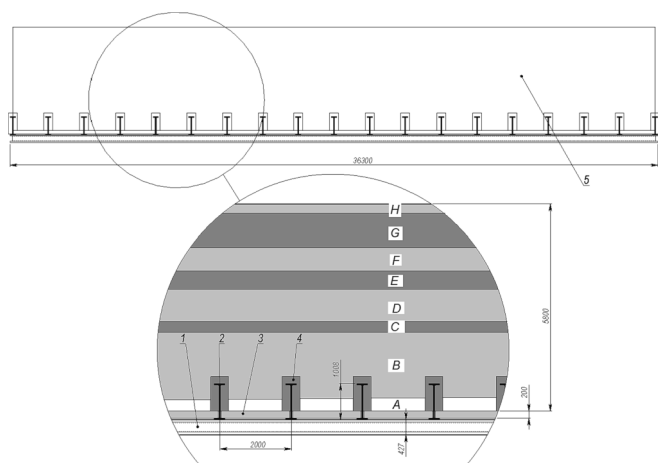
Diagram of cross-section of the engineering barrier of 5.8 m: 1 – H-beam profile HD310x310x500, 2 – H-beam profile HE1000B, 3 – concrete slab of 200 mm thickness, 4 – concreted H-beam profiles HE1000B, 5 – layered engineering barrier of 5.8 m thickness (A – drainage layer of 0.2 m thickness (fine sand); B – insulating layer of 2.0 m (limnoglacial clay); C – drainage layer of 0.3 m thickness (gritty sand); D – protective layer of 0.6 m thickness (moraine clay); E – drainage layer of 0.6 m thickness (dusty sand); F – drainage layer of 0.7 m thickness (gravel); G – drainage layer of 0.8 m thickness (crushed stone); H – vegetation layer of 0.2 m thickness.
